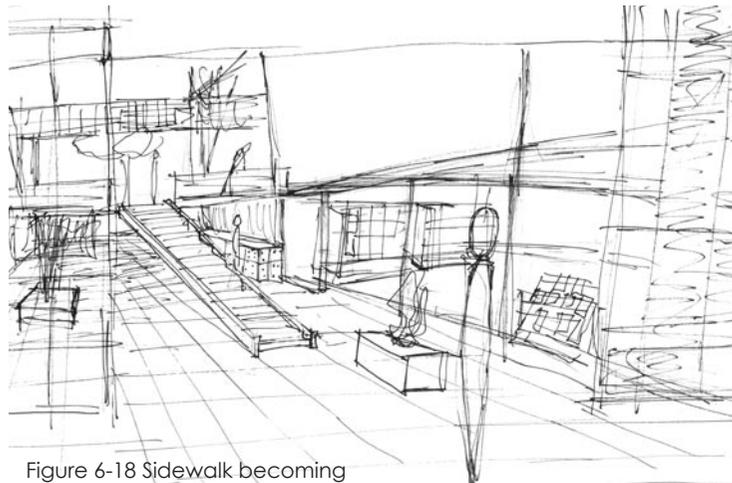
Sidewalk becoming interior space -Concept sketch
